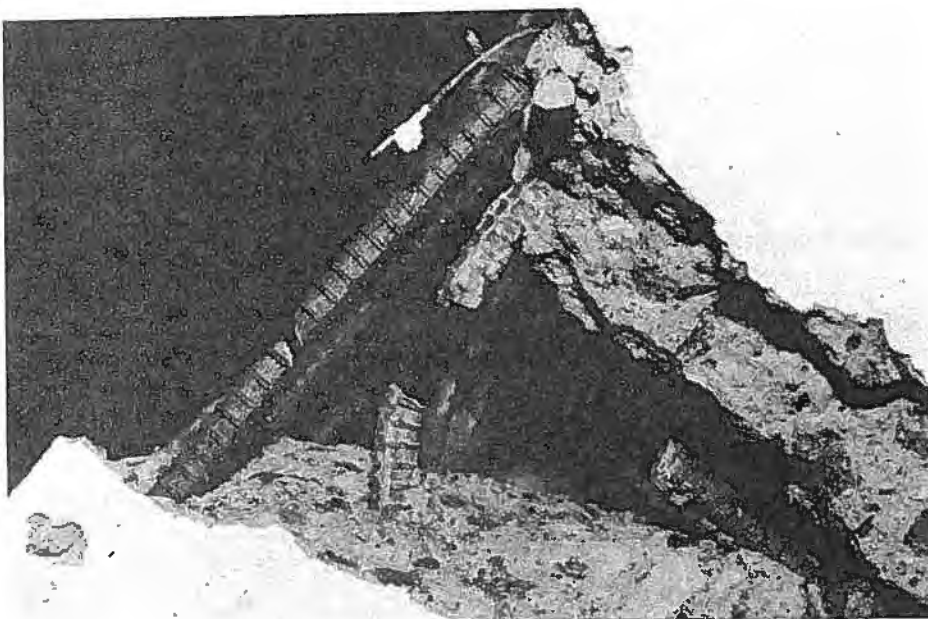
Fatigue failure in the 45° bend in the inner reinforcement. The failure in the outer reinforcement occurred after yielding, when the test specimen was subjected to additional loading following the fatigue failure. Unattached concrete pieces have been removed.
